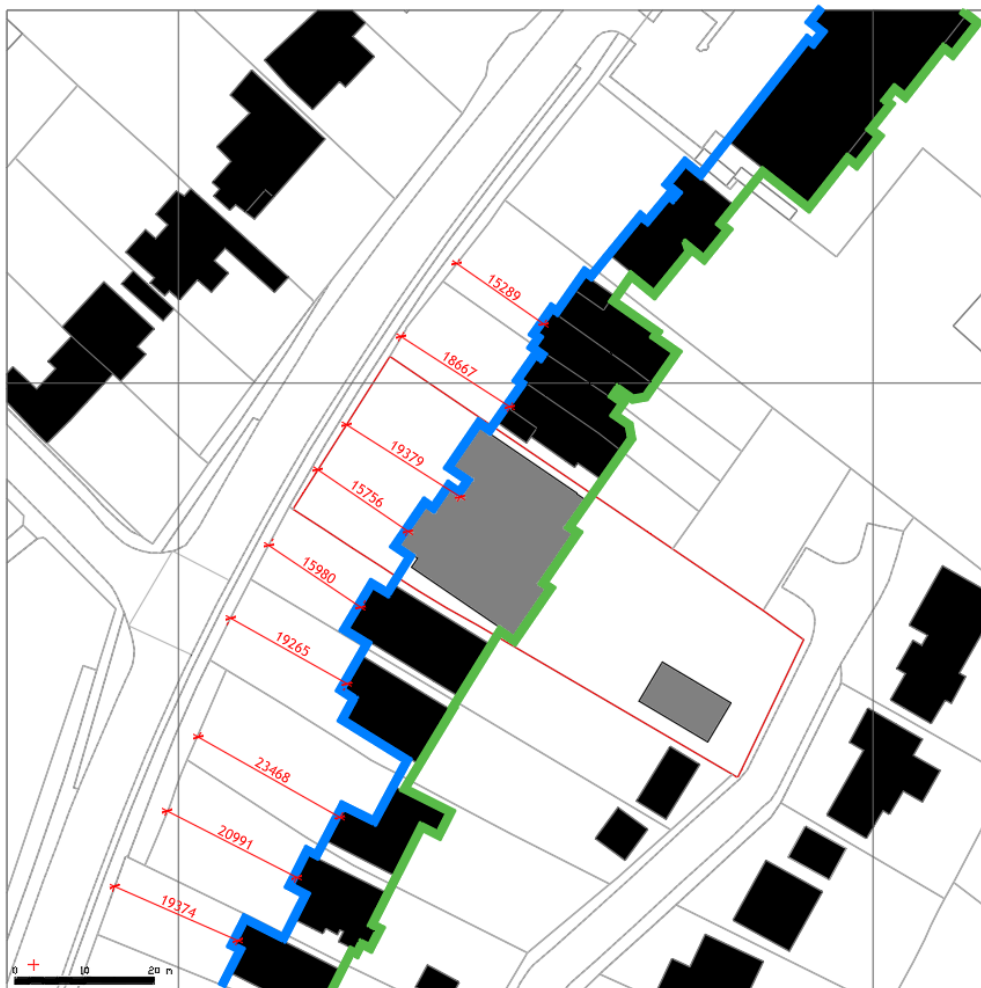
Existing staggered rear building lines along Ducks Hill Road
